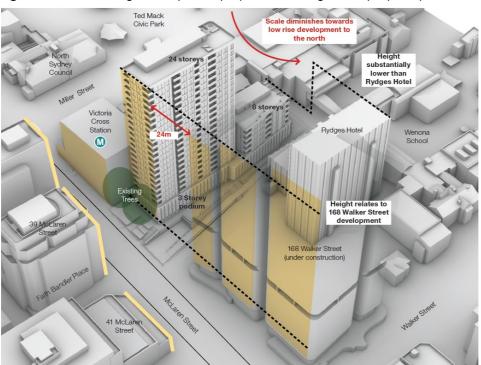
Urban Design Principles of proposed building envelope (GHD)
